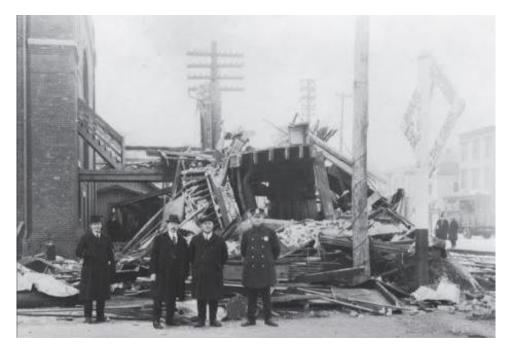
The destroyed brick signal tower would be replaced by the Nassau Tower in 1923. The platform and stair that connected the tower and the Substation is clearly visible at left. These were likely demolished around the time of the new tower's construction. Source: *Long Island Rail Road: Oyster Bay Branch*, 28.
